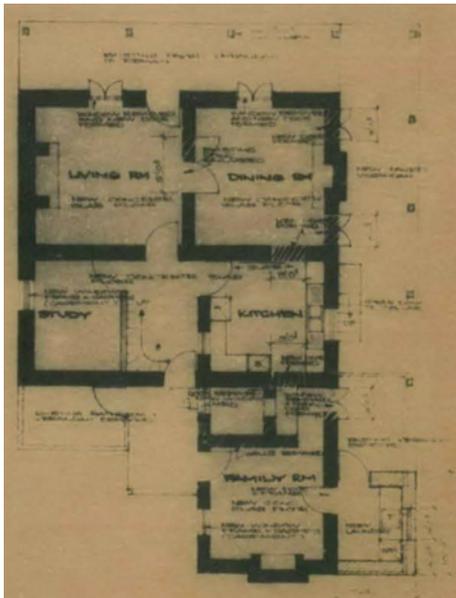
, Ground floor plan, Ian McKay Philip Cox, 08.01.1968
